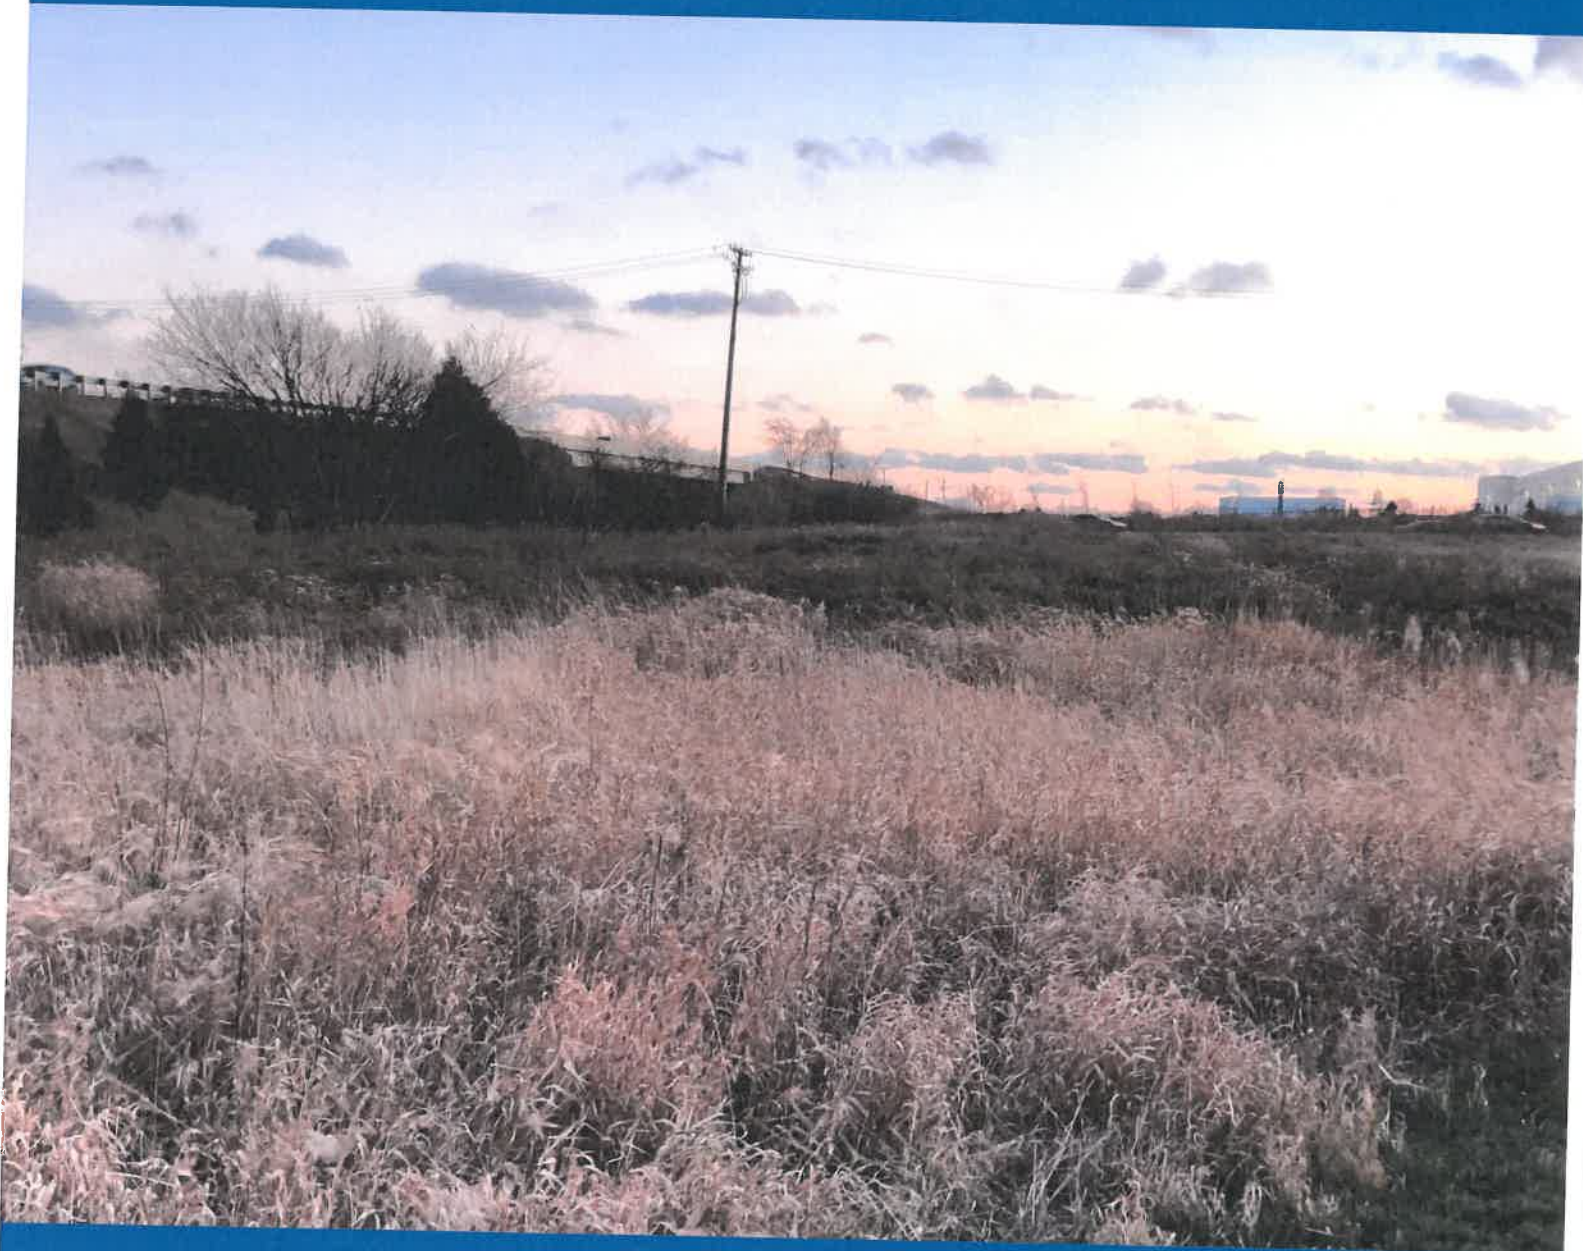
Randall Rd. Looking West at Existing Berm & Dock Area
